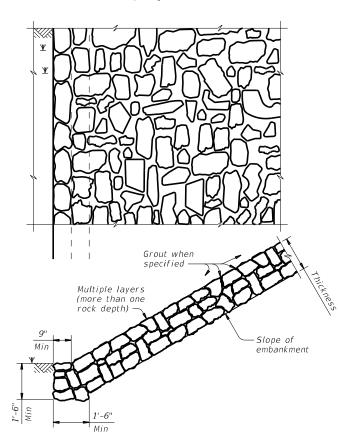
~ COMMON STONE RIPRAP dry or grouted
